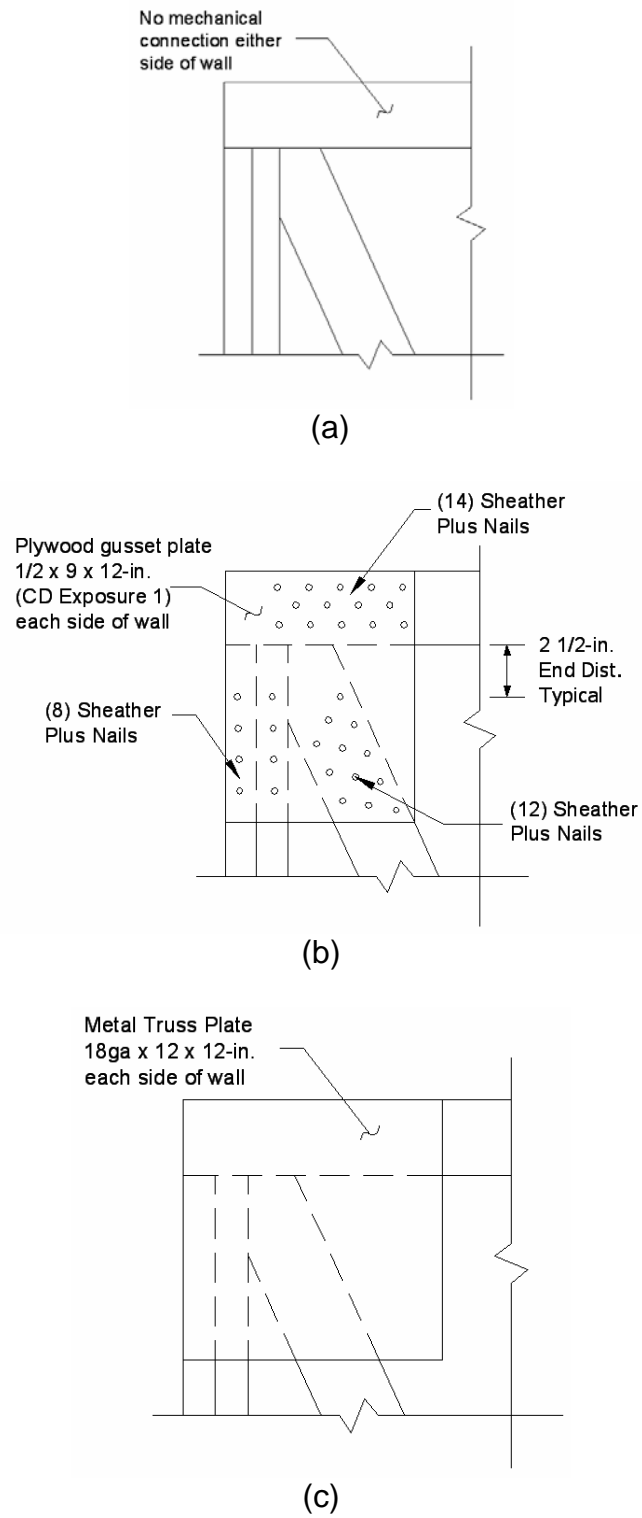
Corner connections between cross-brace, end stud, and sill plate for (a) Type 2, (b) Type 3, and (c) Type 4 shearwalls.
